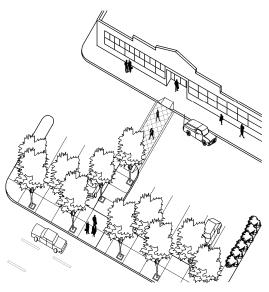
All buildings must have clear pedestrian access from the sidewalk.
